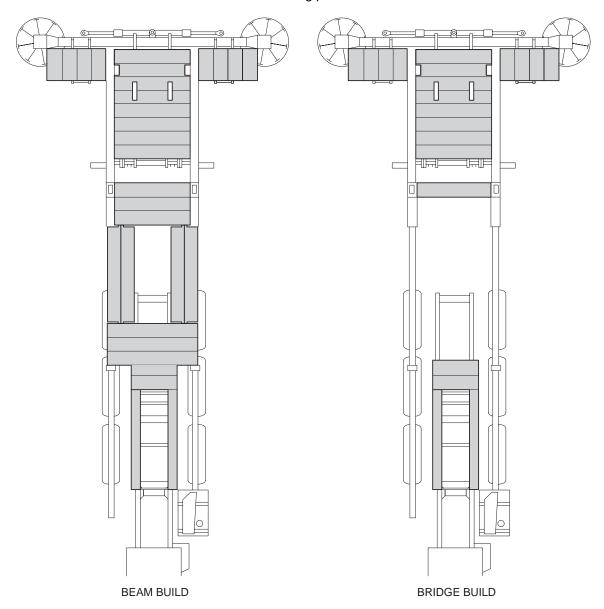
23 Slide Frame Decking Panels (Beam Build)
